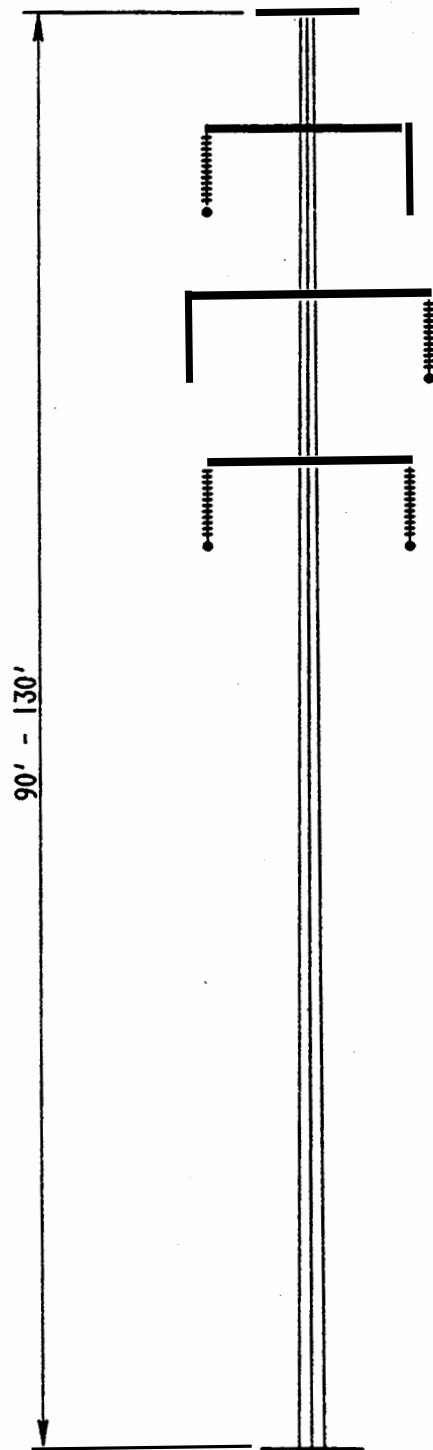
ALTERNATIVE SINGLE-SHAFT STEEL POLE STRUCTURE
